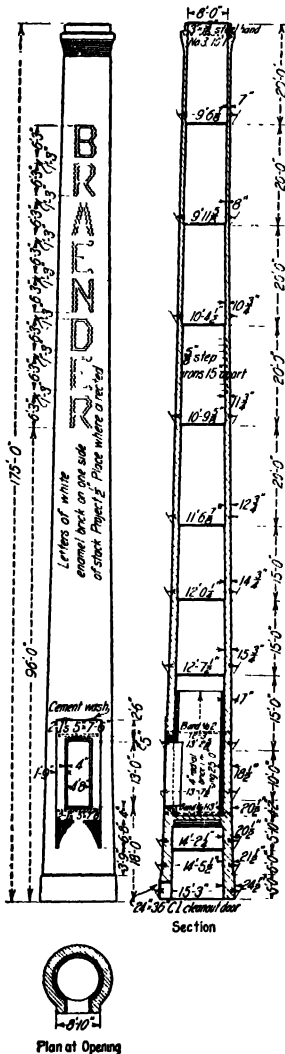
Elevation and section of a radial brick chimney built by the Heine Chimney Company.
